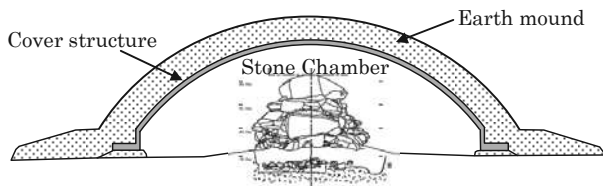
Schematic view of the restoration plan for the Garandoya Tumulus
